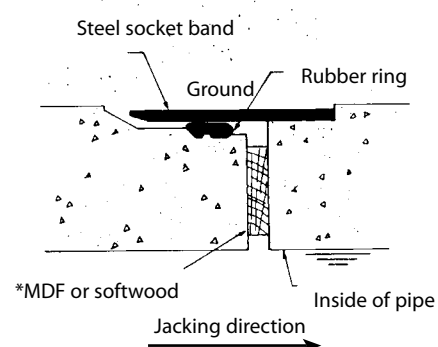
, Joint Profile Steel Collar Joint (SCJ)
